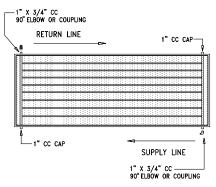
COLLECTOR PLUMBING - HORIZONTAL MOUNT
